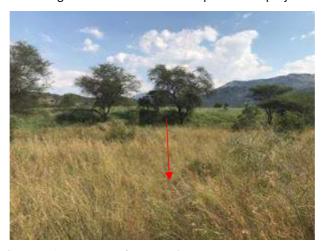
Topsoil Stockpile #3 (arrow indicating area of extension)
